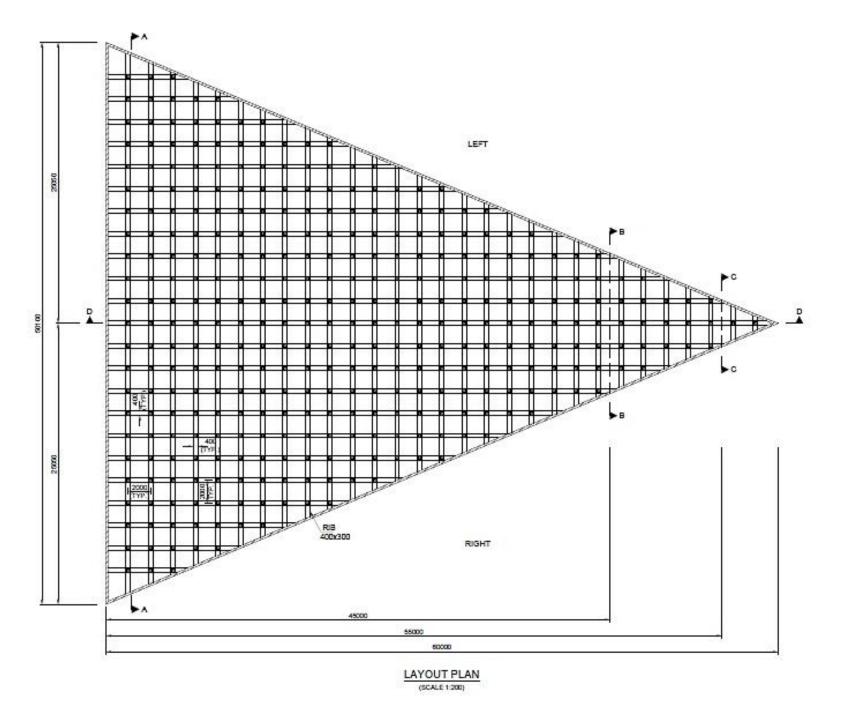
Layout plan of concrete caisson of 150 mm wall thickness and internal beam spacing of 2 m
